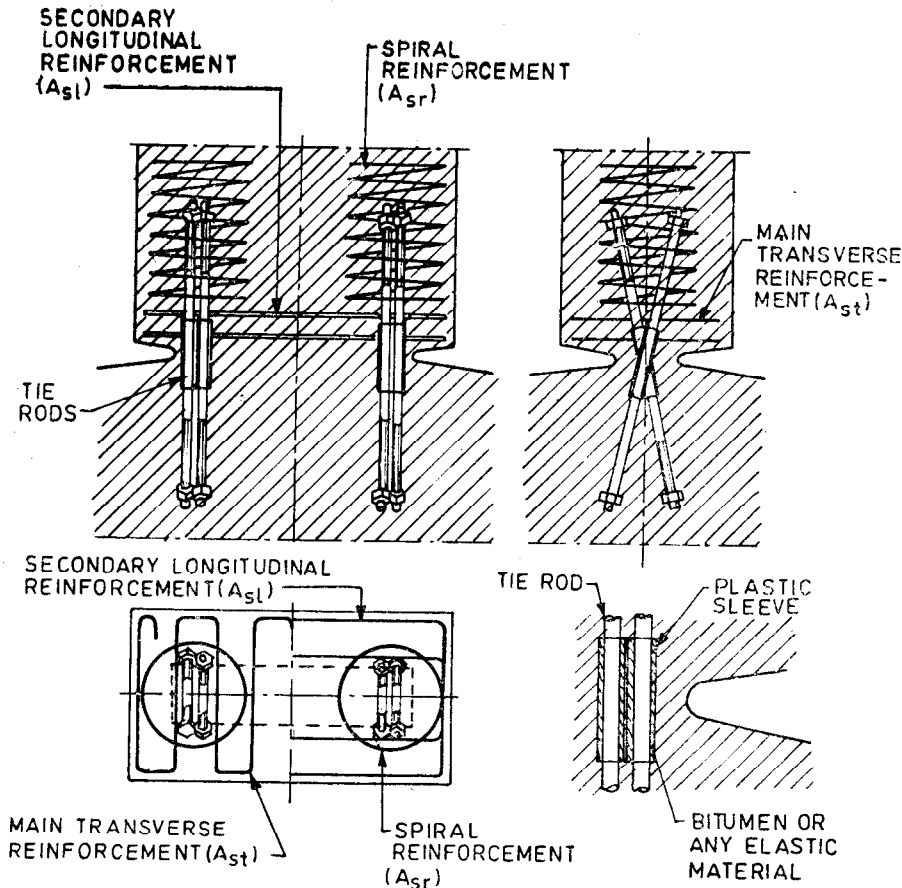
ALTERNATIVE ARRANGEMENT OF HINGE REINFORCEMENT
